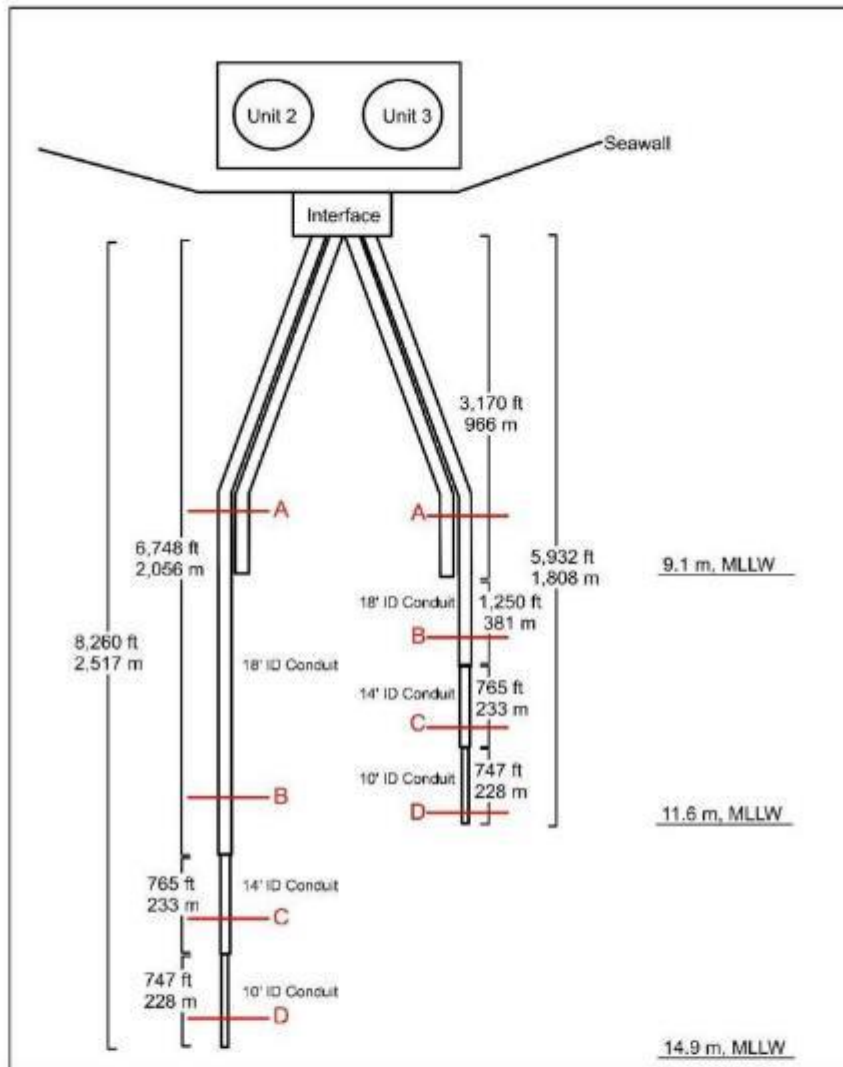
Plan View of Units 2 & 3 Offshore Conduits and Associated Water Depth. Water Depths are Indicated and Referenced to MLLW (epoch 1941-1960).
